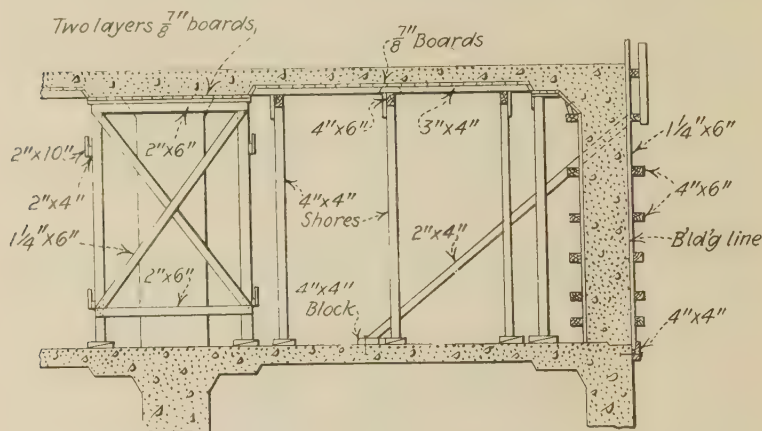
ELEVATION COLUMN AND SLAB FORMS.
